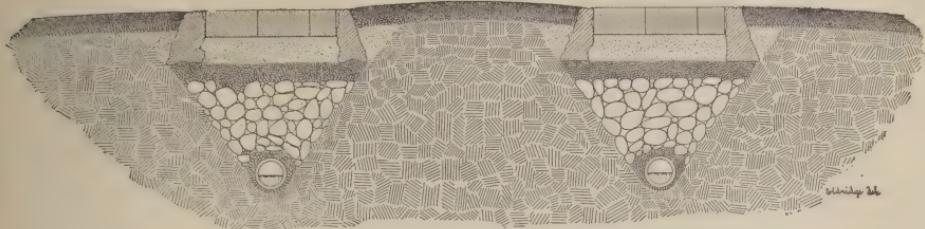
Cross-section of brick trackways, under-drained and stone curbed.
